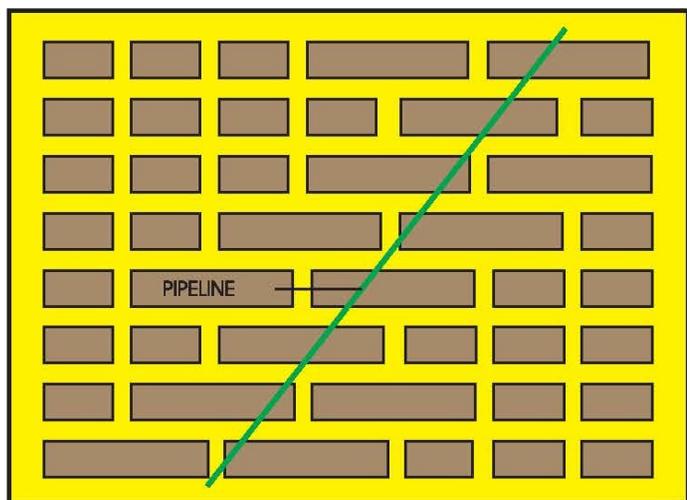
INITIAL LAYOUT OF PILLAR SUPPORT CONTEMPLATED OVER THE PIPELINE
